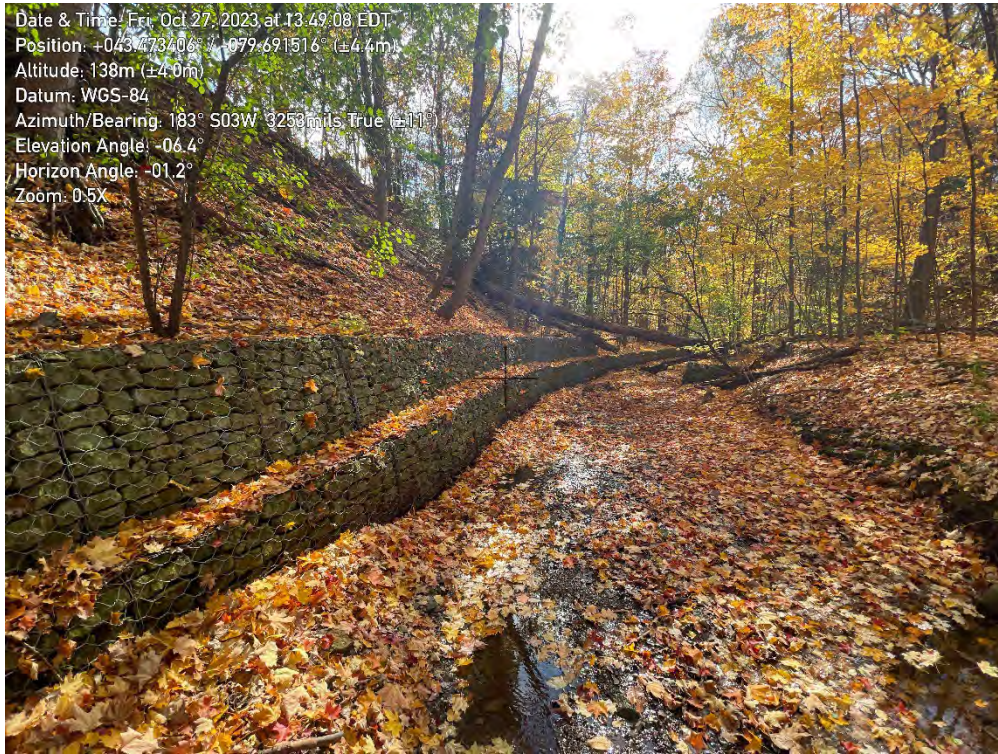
View of valley wall slope in Zone B32 of the East Morrison Creek, looking Southwest.
